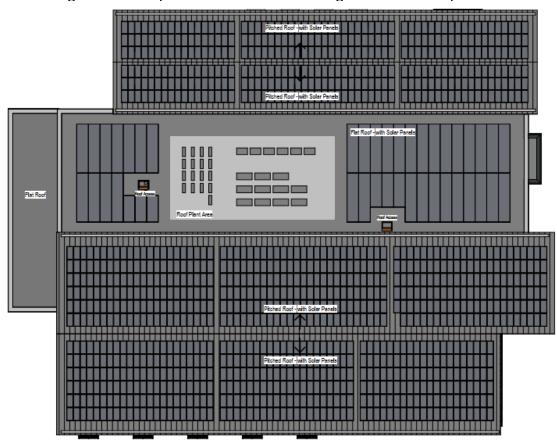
The Proposed Roof Plan showing extent of solar panels
